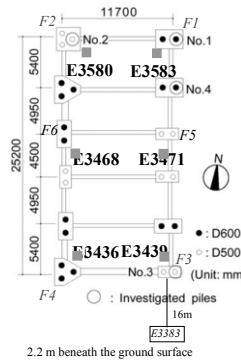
Configurations of the pile foundation, the soil elements, and the beam elements.
